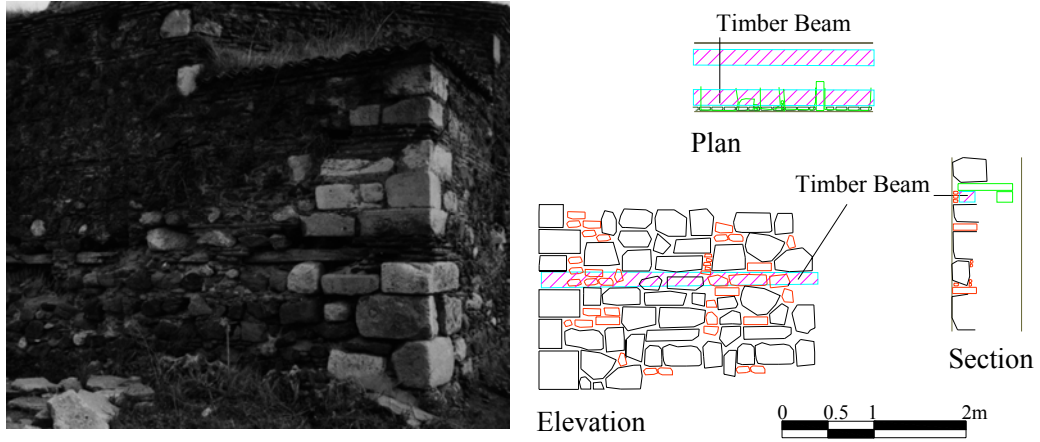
Seferihisar Büyük Hamam, North elevation, Rubble stone-bricks in some places and large pieces of bricks in joints
